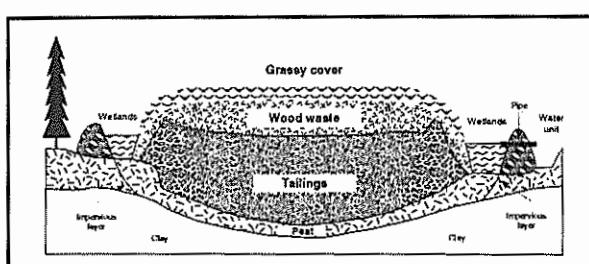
Section of reclamation concept of East Sullivan tailings pond.
